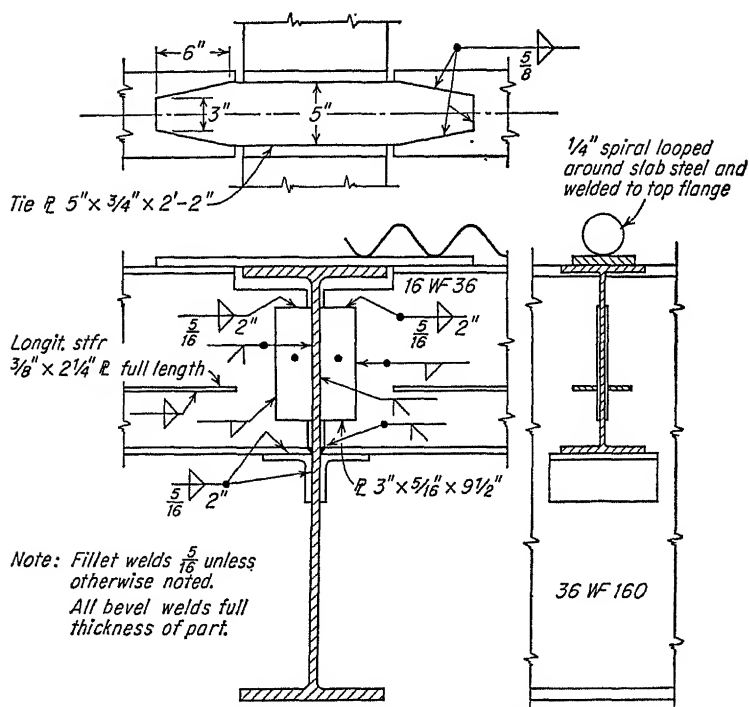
Purlin-to-girder connection [Chap. 1, Ref. 8].
